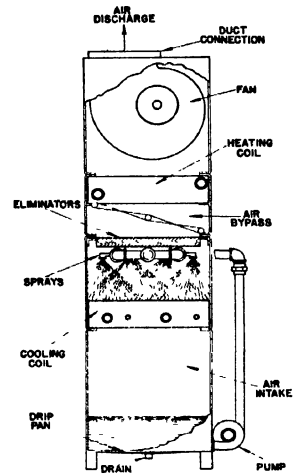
(right) SPRAY TYPE REMOTE UNIT AIR CONDITIONER
